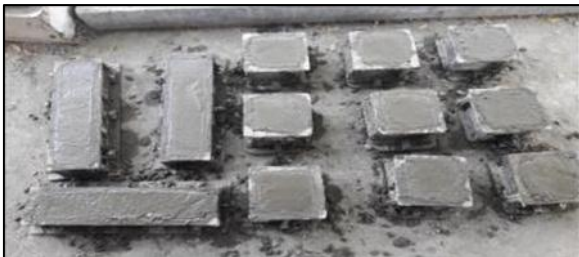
Concrete Mix With 10% ESP as Partial Replacement for Cement and an Additive of 1% Steel Fiber
